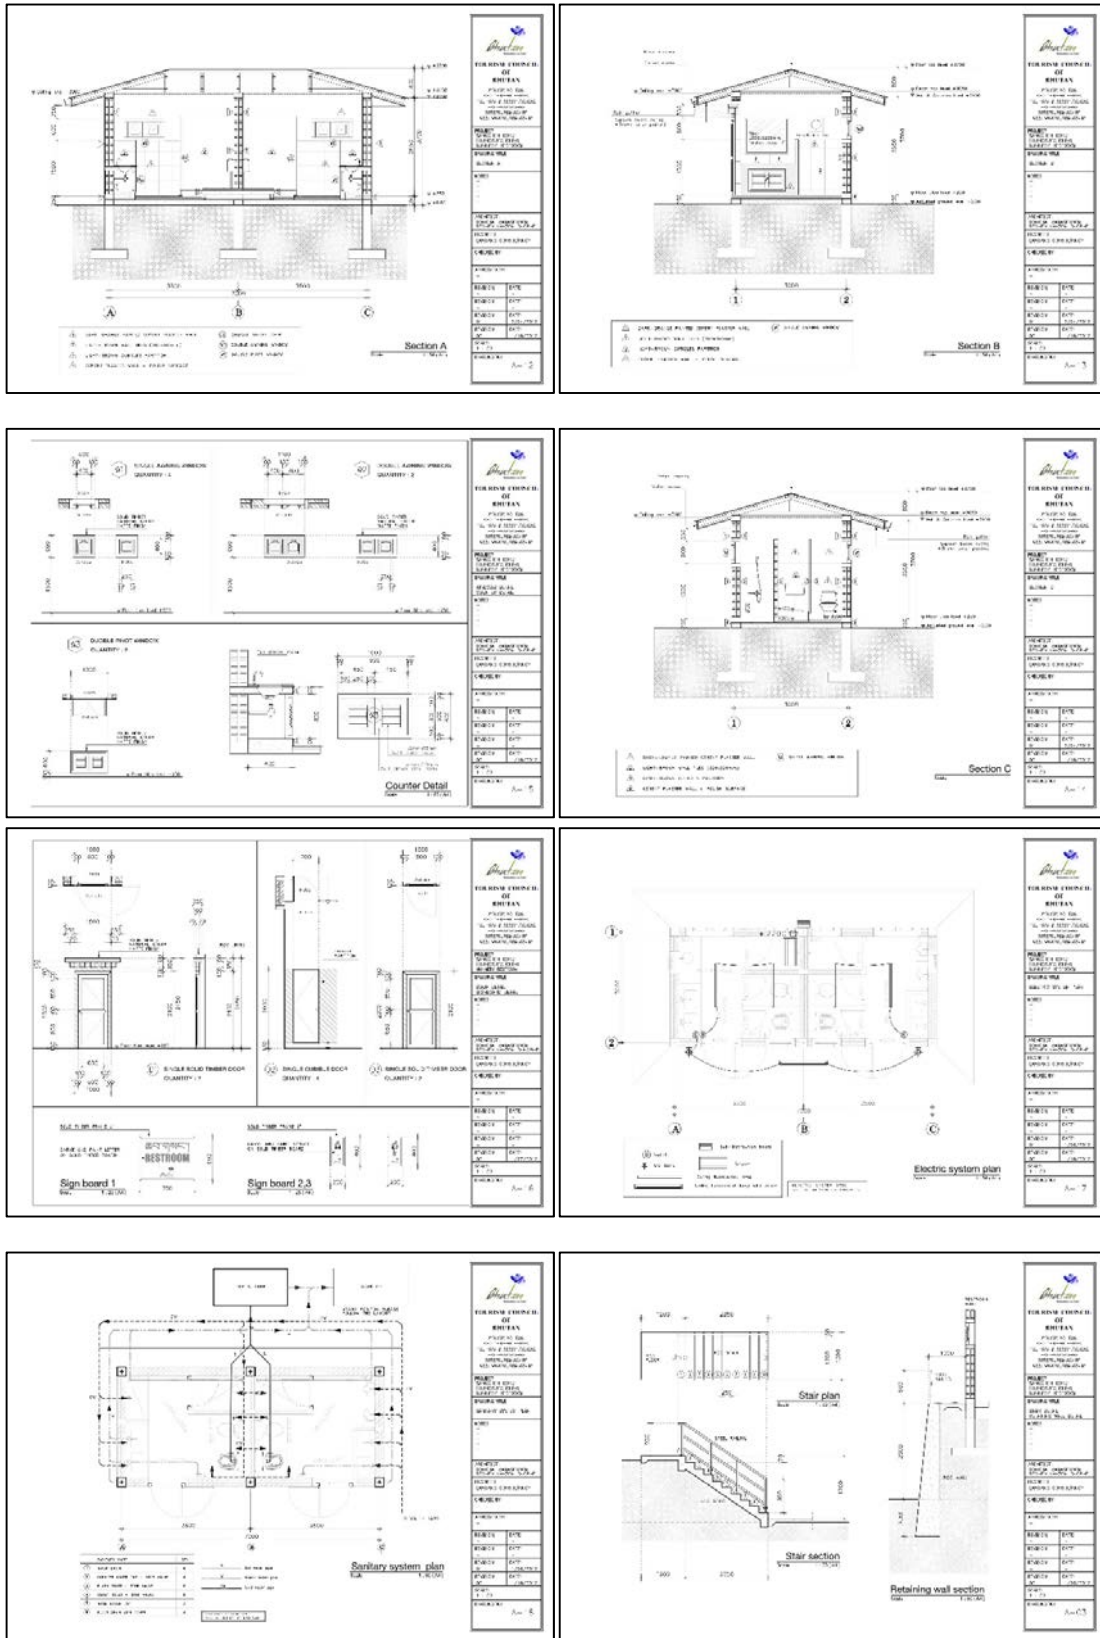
Construction drawings of Sangchen Dorji Lhundrup nunnery restrooms
